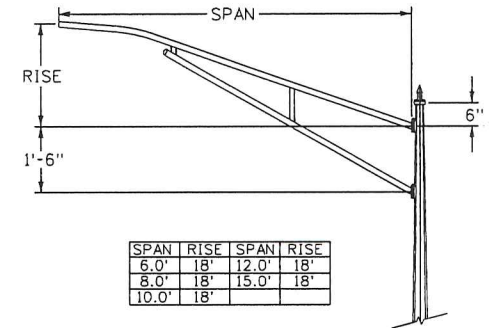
TYPICAL ONE LUMINAIRE ARM
